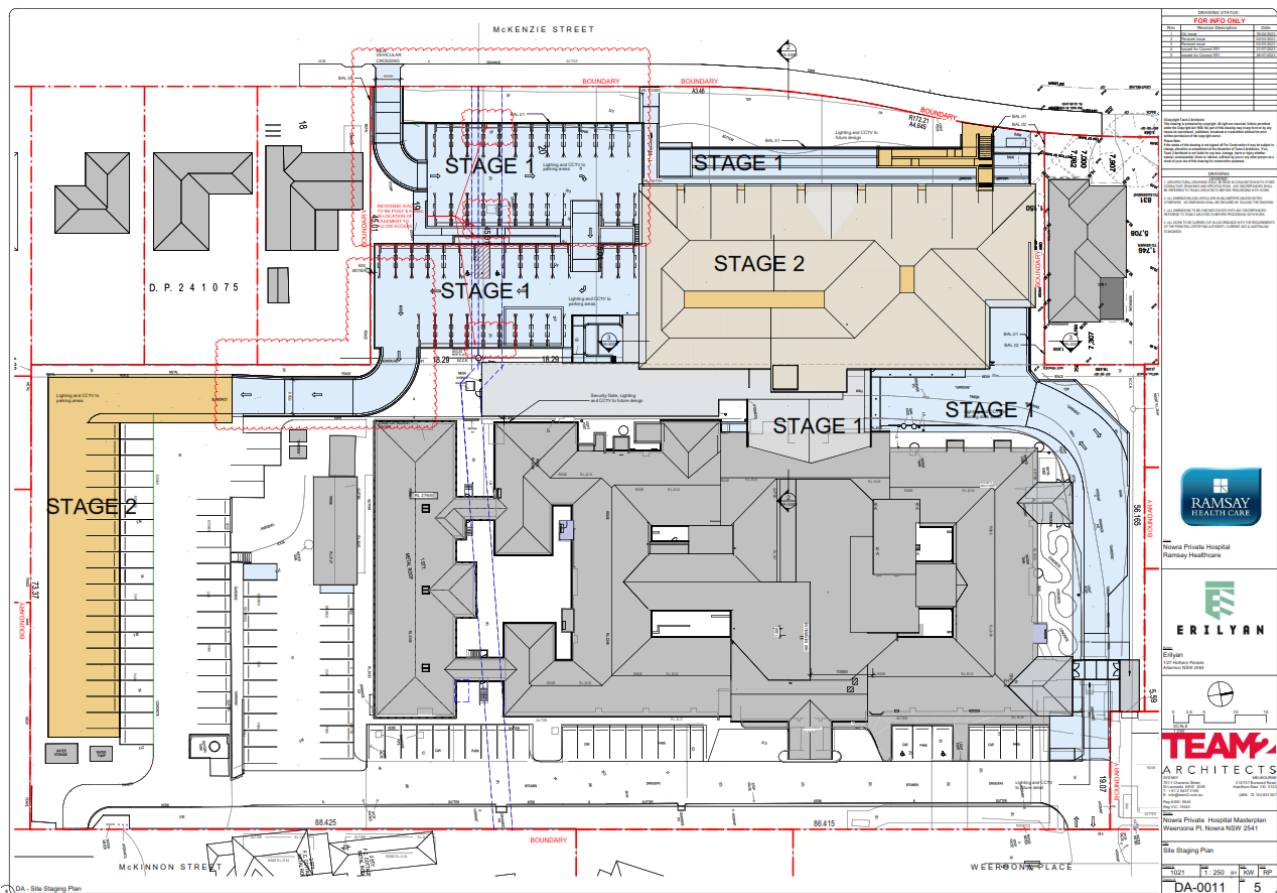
Proposed Site Staging Plan by Team 2 Architects (Revision 5, dated 28/07/2023)
